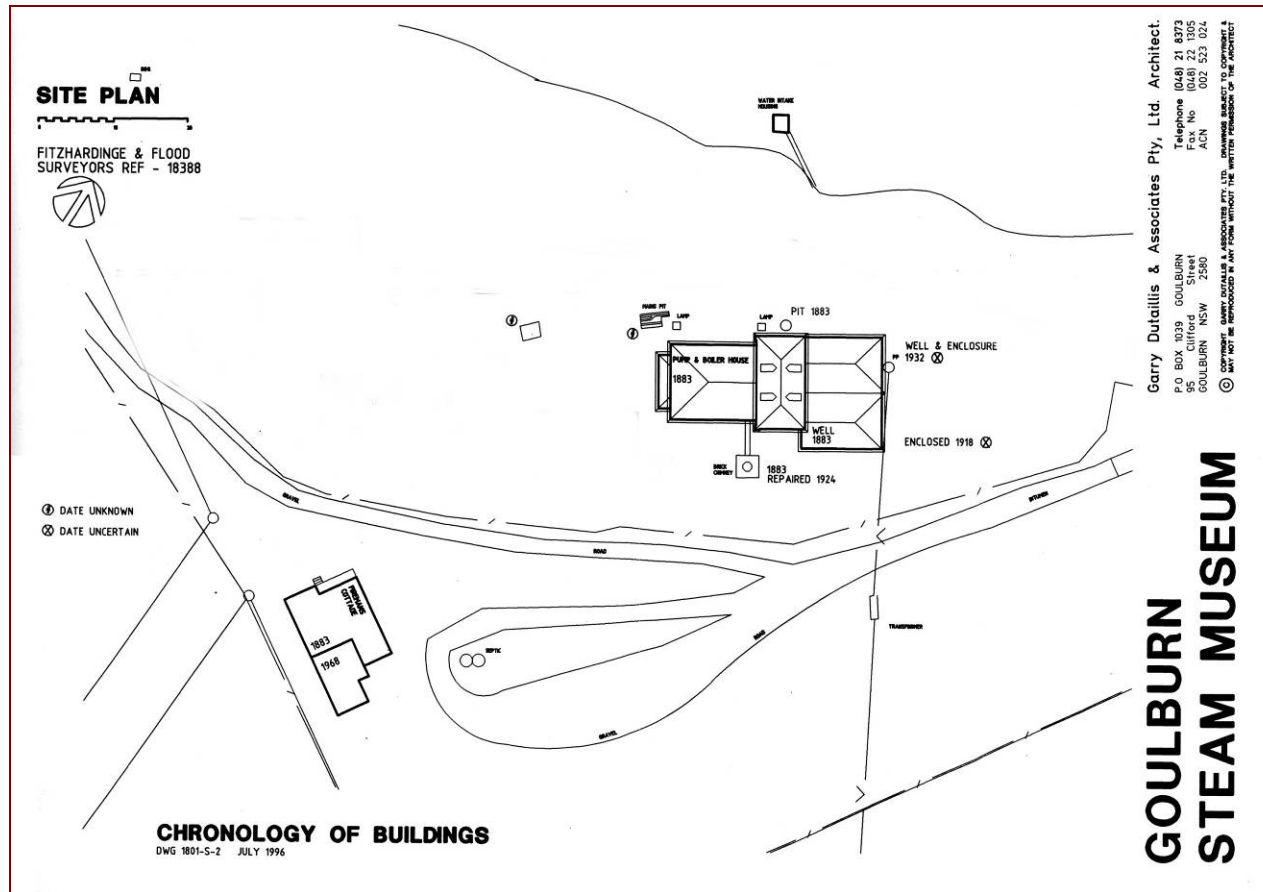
Layout of the Waterworks' Pumphouse building, showing the chronology of the building's development (plan edited slightly from the original contained in the 1996 CMP).
